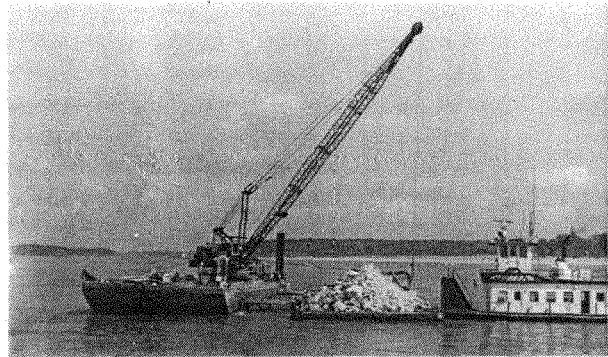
View of construction setup with rock barge positioned against spreader box template.
